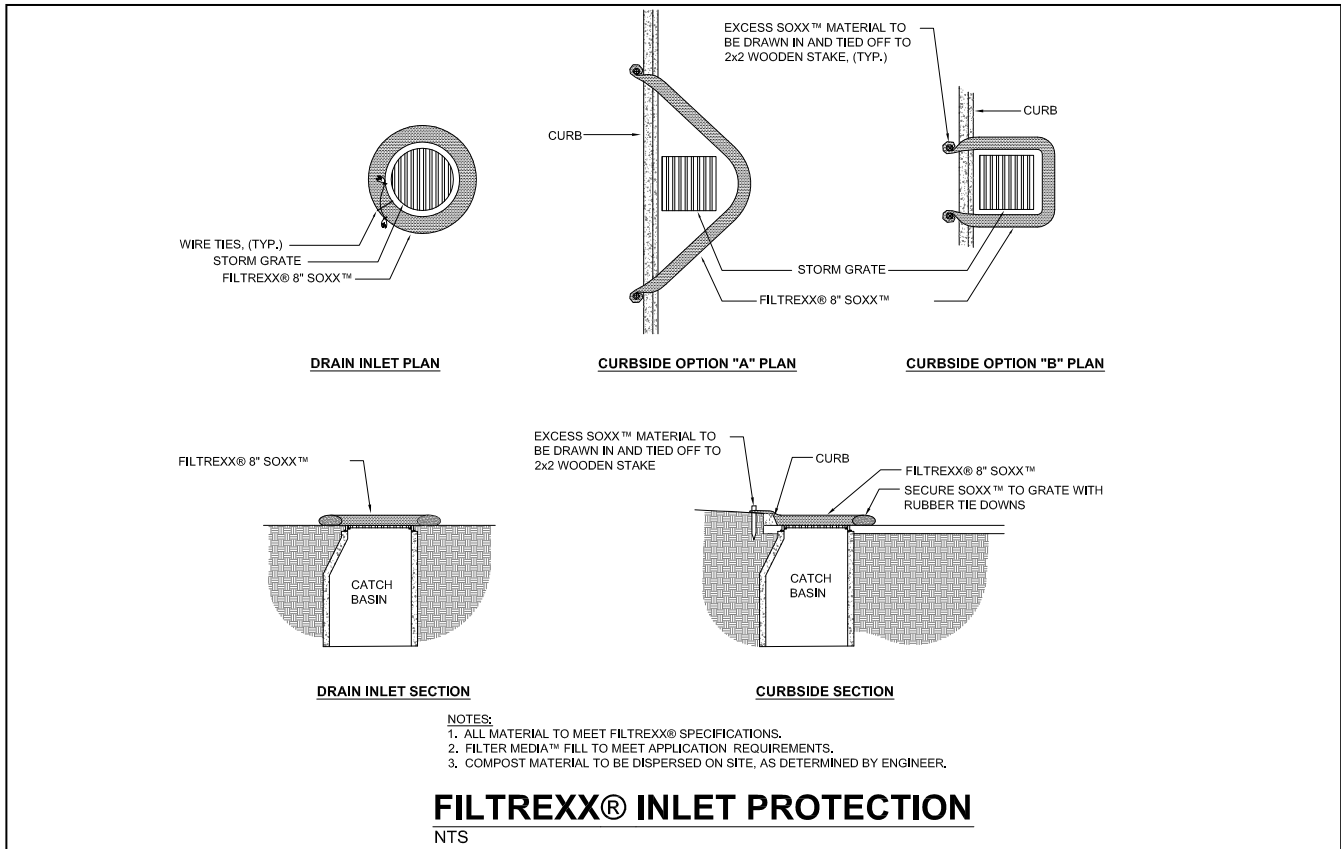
Engineering Design Drawing for Curb Sediment Containment Inlet Protection
